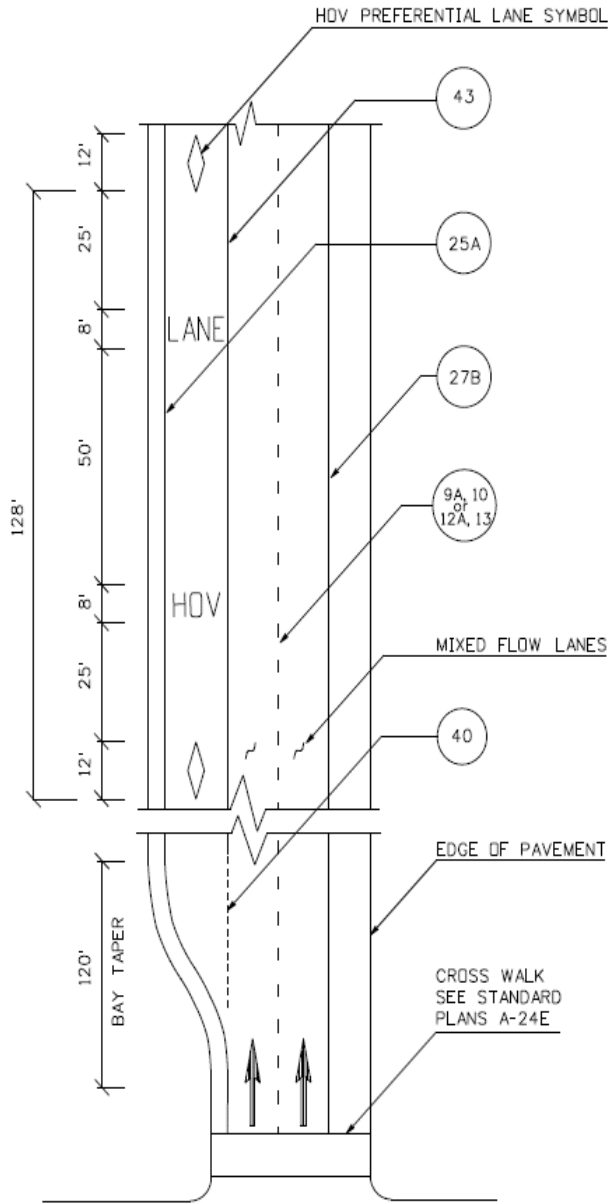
Typical HOV Preferential Lane Pavement Markings
